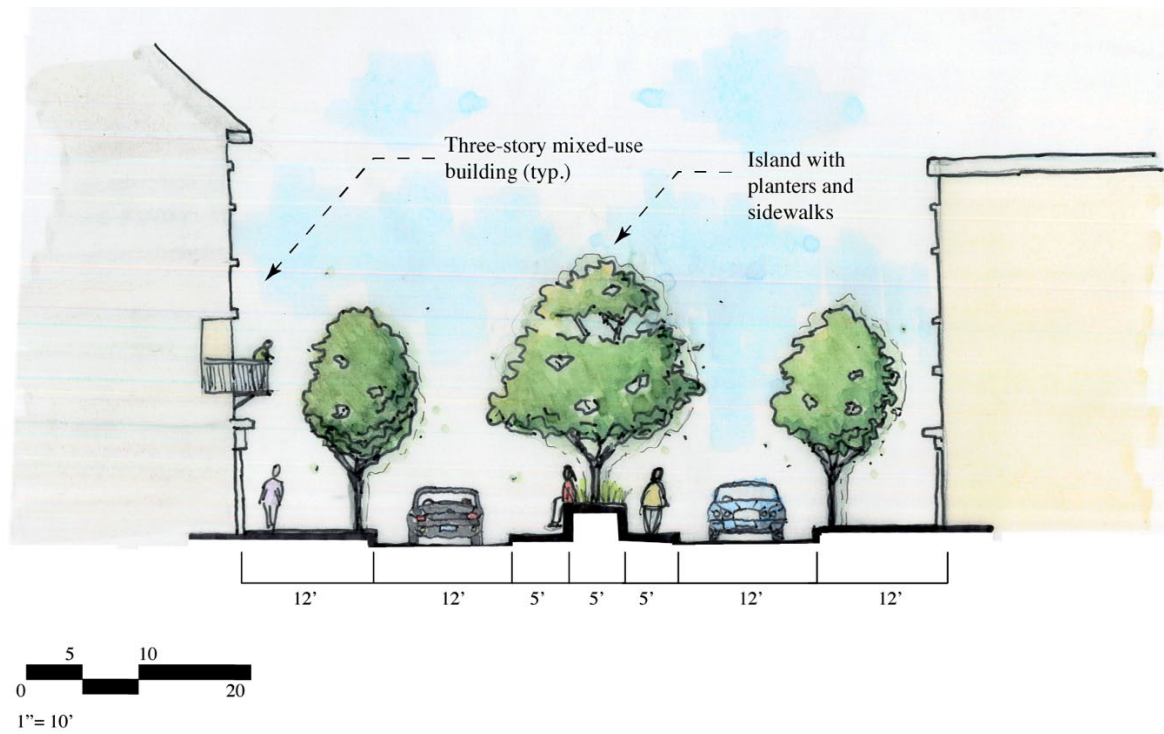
Section view of Centre Avenue streetscape between Devilliers Street and Erin Street.
